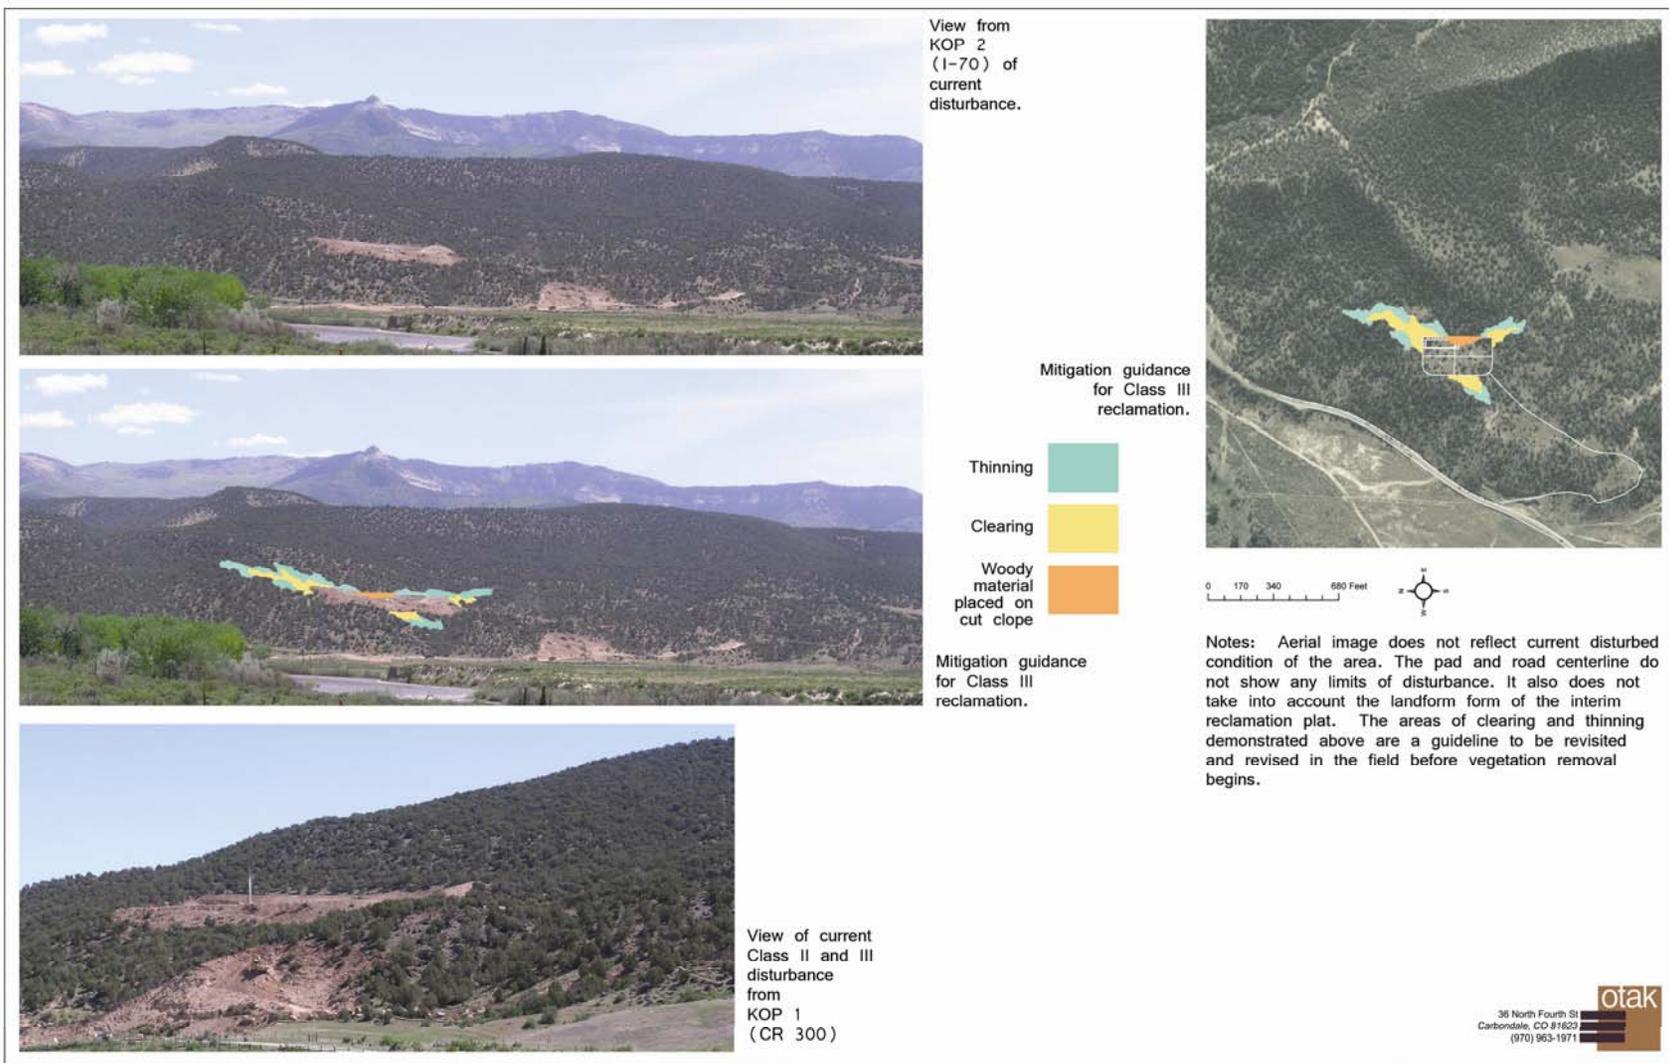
Conceptual Visual Mitigation Plan for SG41-26 Pad and Road.
